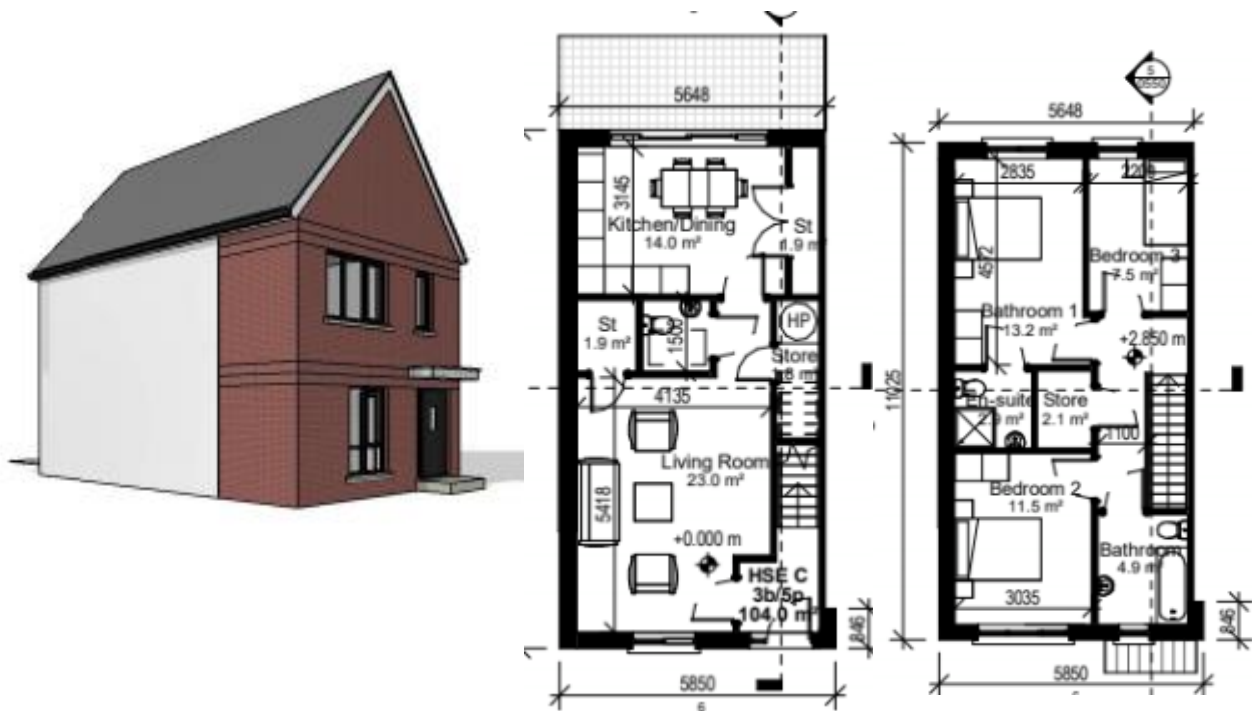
Front elevation and Proposed Ground and First Floor Plan of House Type C.
